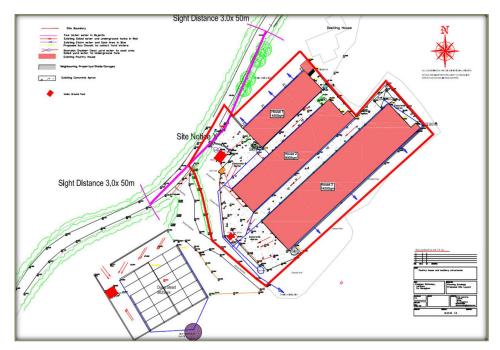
Proposed Site Plan (as prepared by David Leonard)
